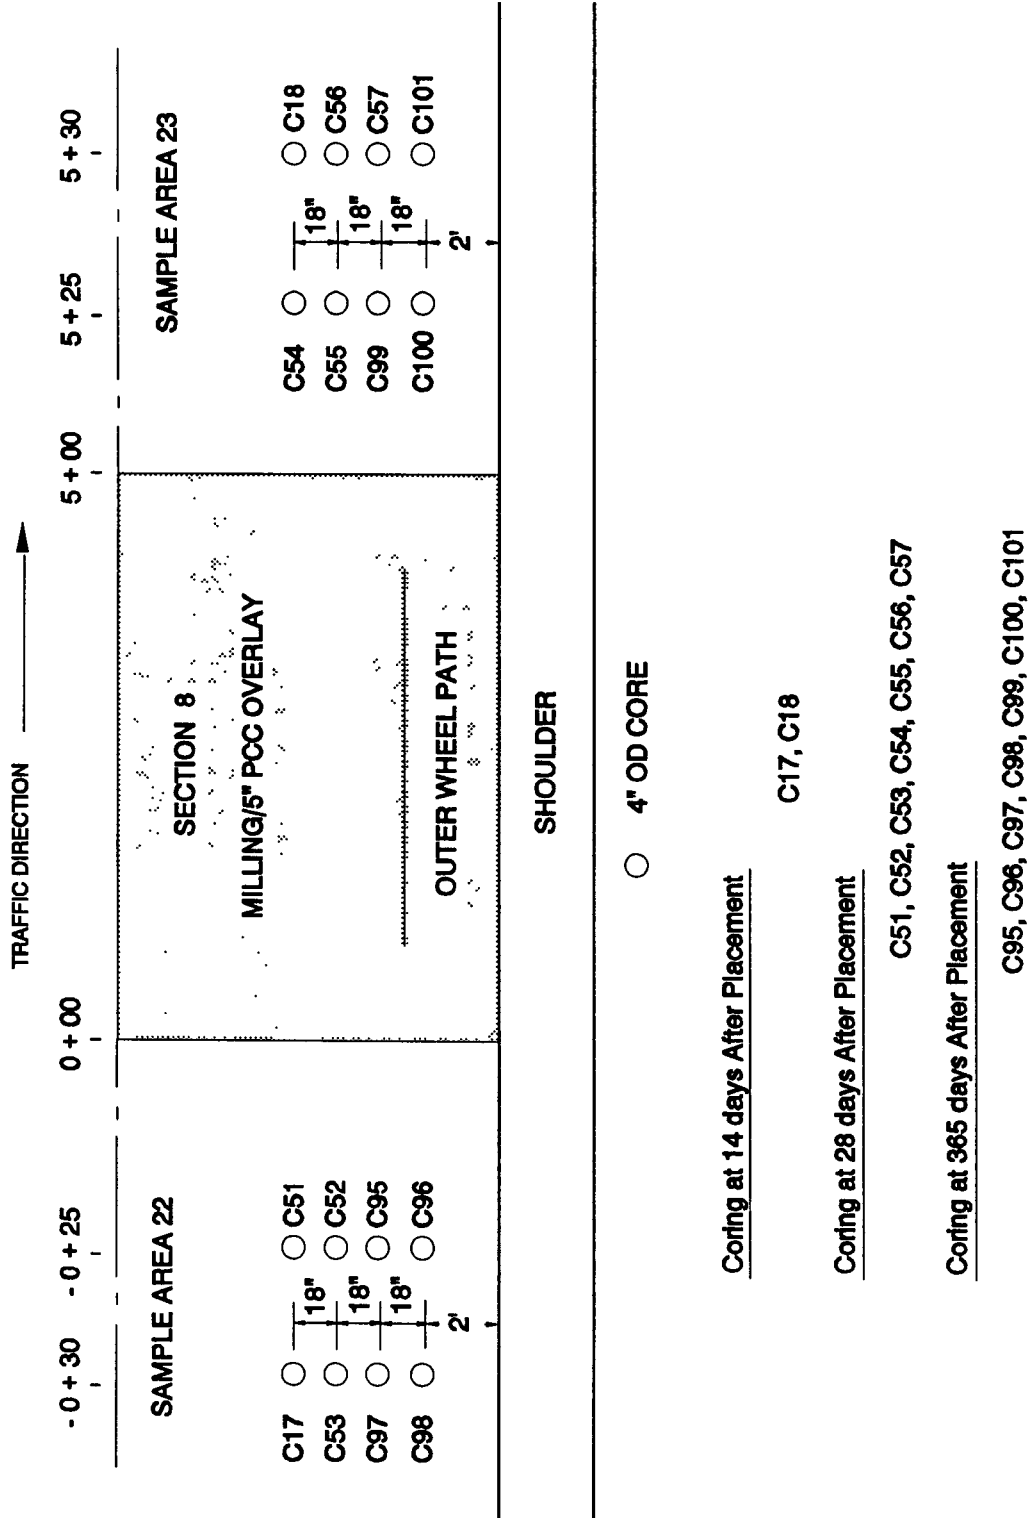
Example of "Post-Construction" Sampling Plan for Test Section 8
